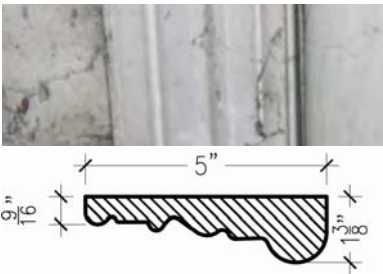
Door D001 casing molding type-1 photo and profile. (Photo: BBB, 2007)
